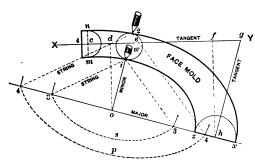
Face Mold for the Wreath Shown in Fig. 60.
